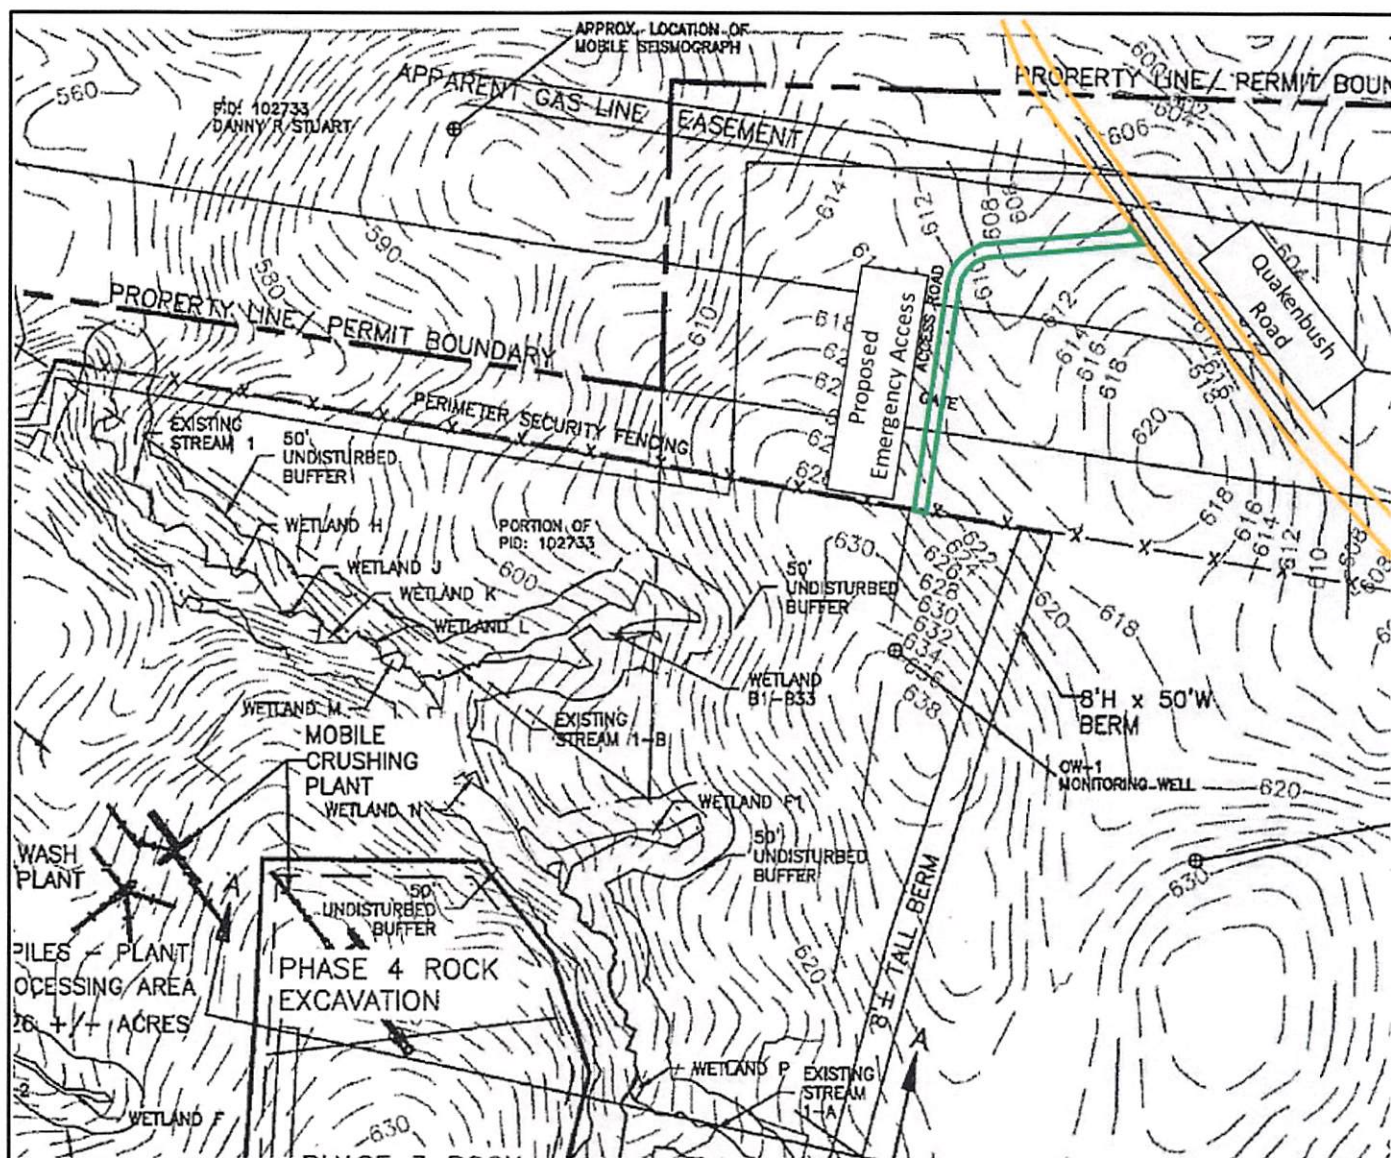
B. Location of the Proposed Emergency Access Route Intersecting Quakenbush Road
